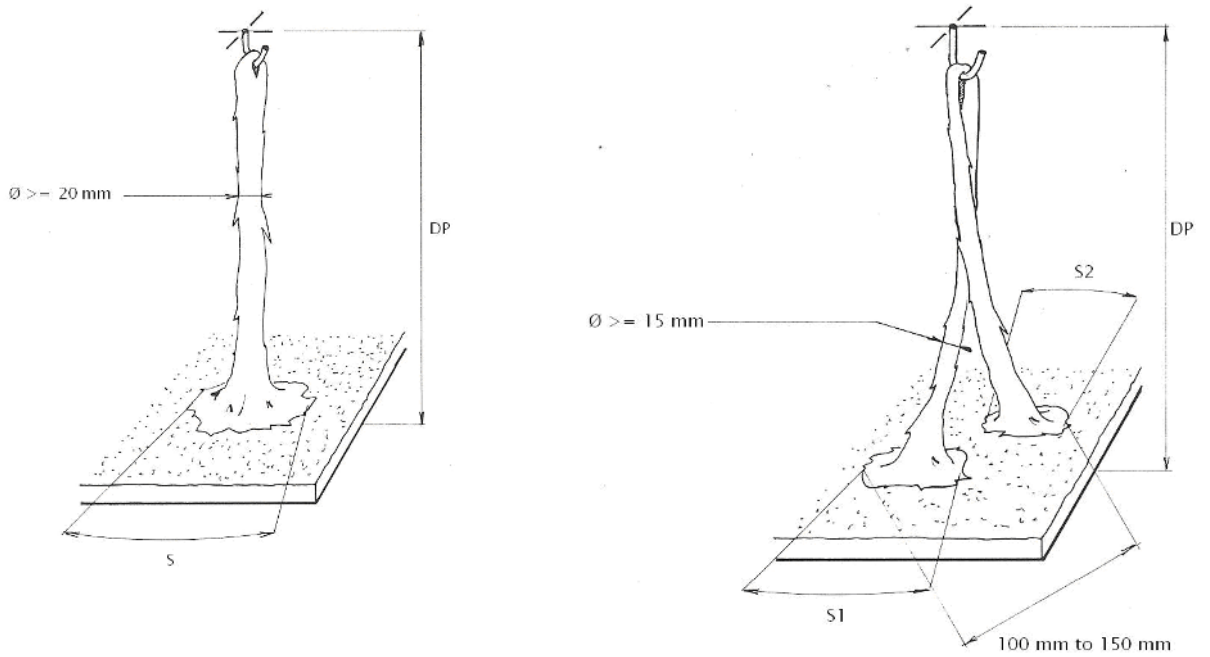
Example of anchoring to an old reinforced plaster ceiling
